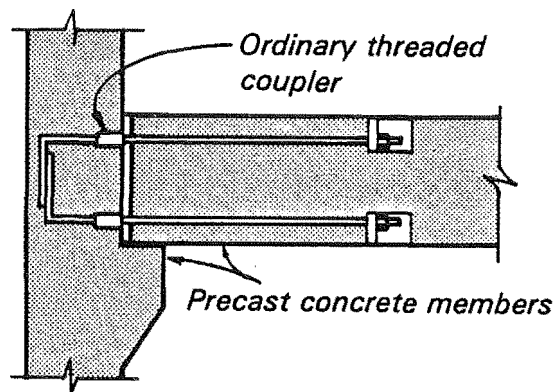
Connection Using Threaded-Tapered Bars and Steel Couplers Tested by French et al (1990).
